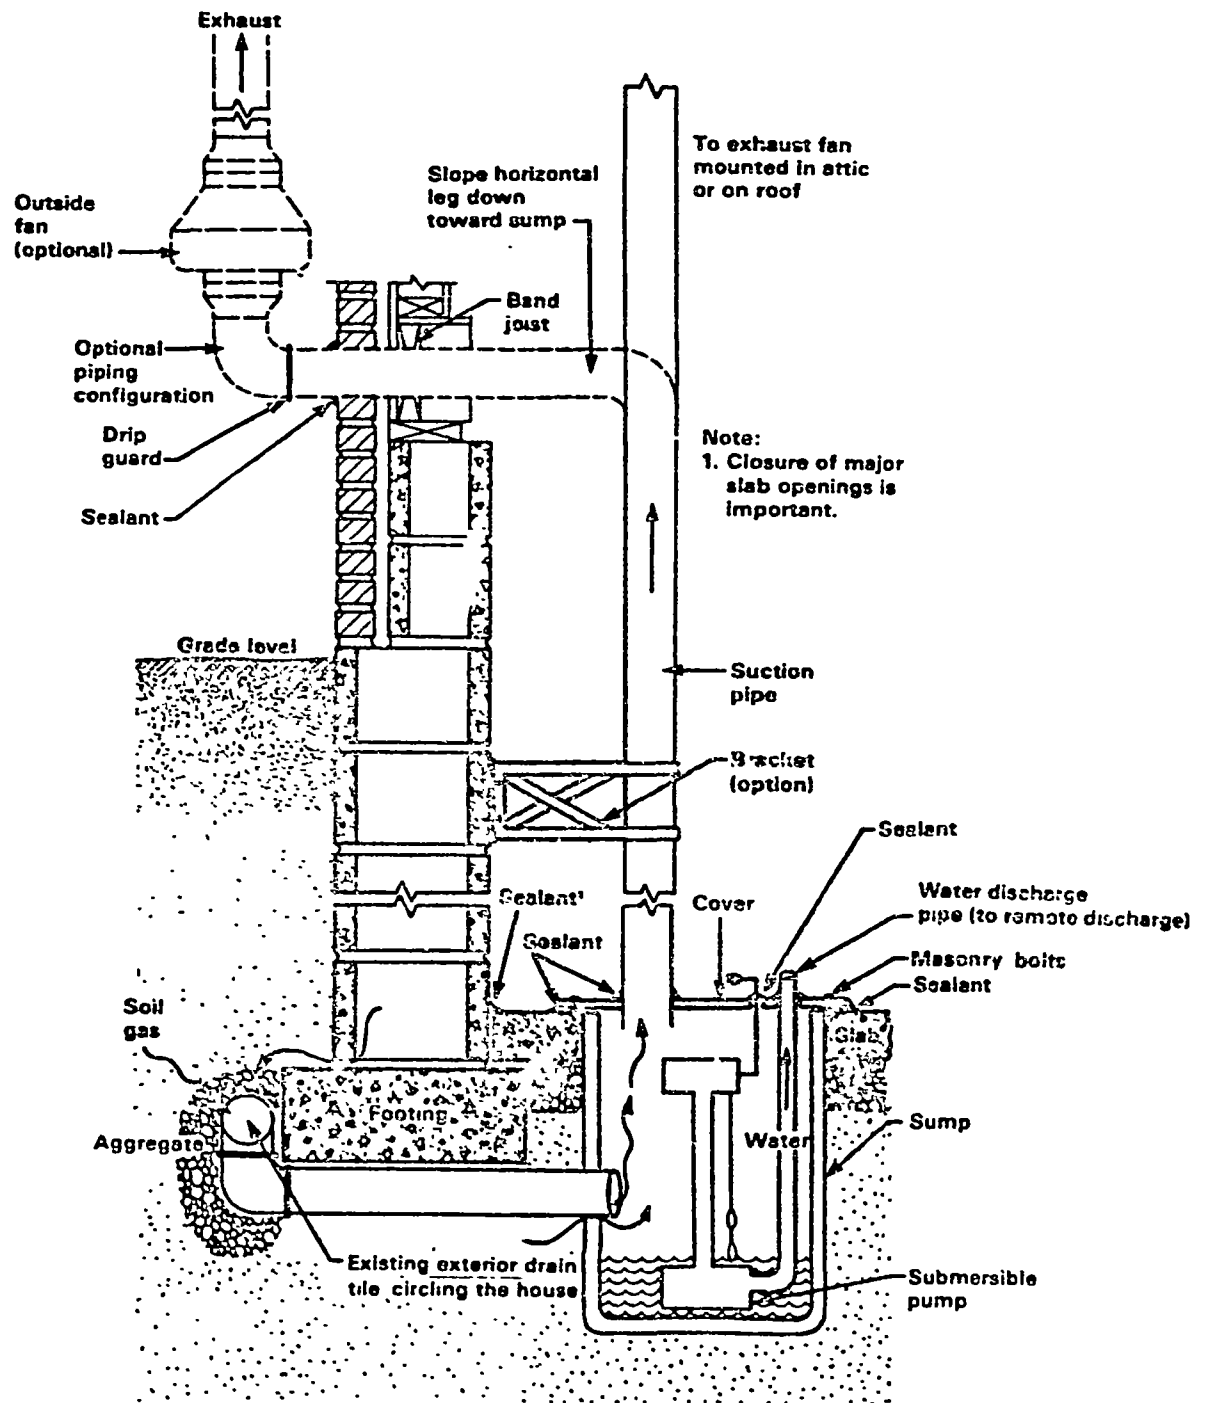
TYPICAL DRAIN TILE VENTILATION SYSTEM
